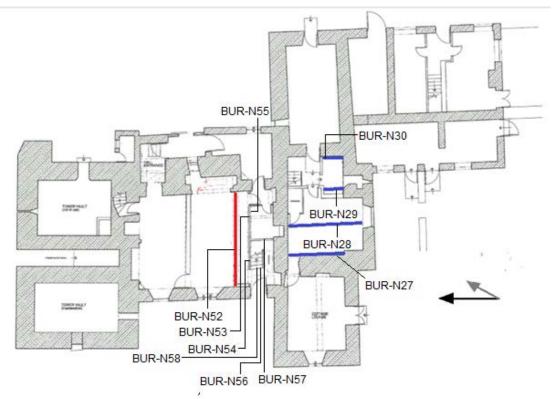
Ground-floor plan showing the location of the sampled timbers, samples BUR-N27-BUR-N30 and BUR-N52-BUR-N58 (after Crosby Granger Architects 2018)
